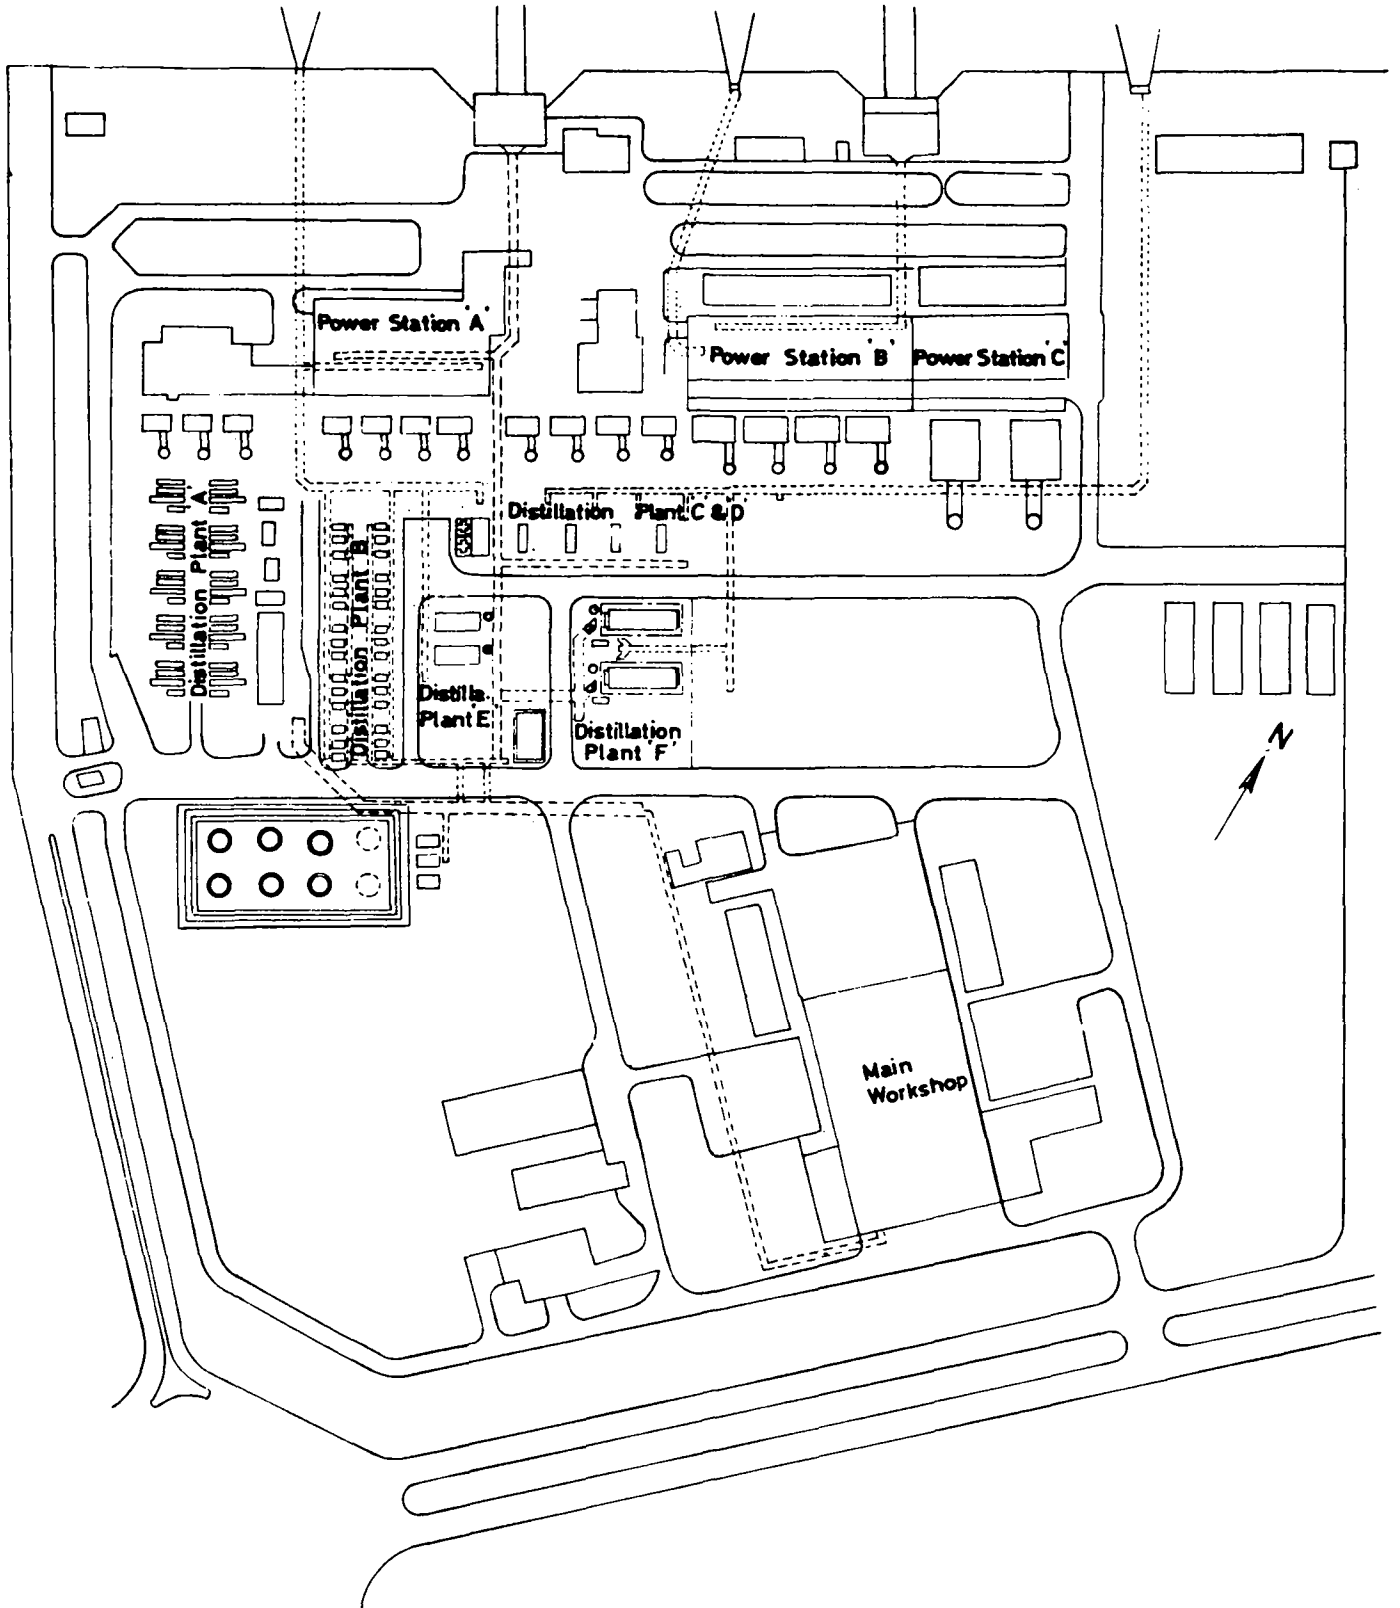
Site layout for Shuwaikh Power and Distillation Plant
